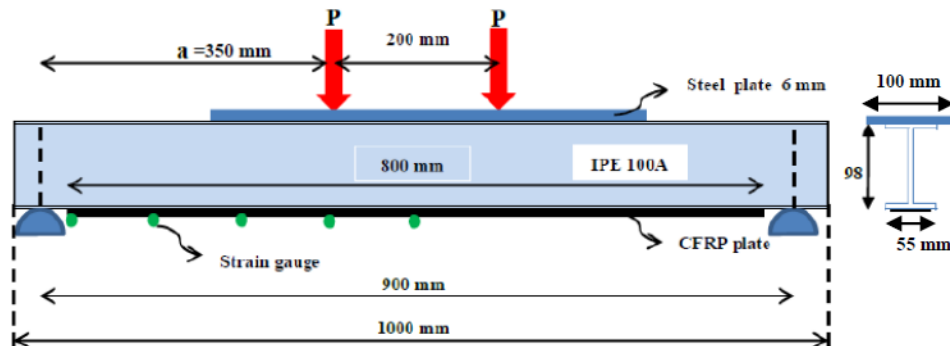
Geometry of I-section steel beams strengthened with CFRP plate
